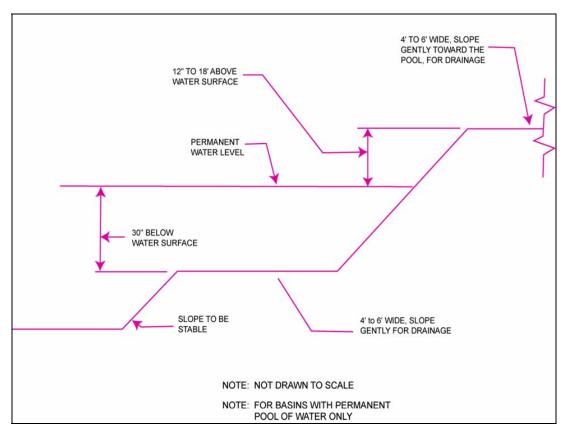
Elevation View of Safety Ledges in a New Stormwater Management Basin.
